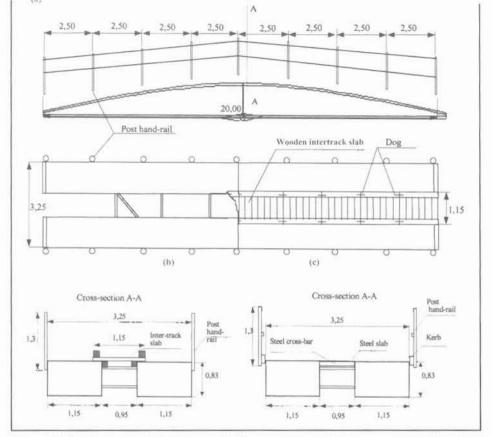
A scheme for building up a BLG span: (a) and (b) use wooden intertrack slabs, and (c) uses steel intertrack slabs.
